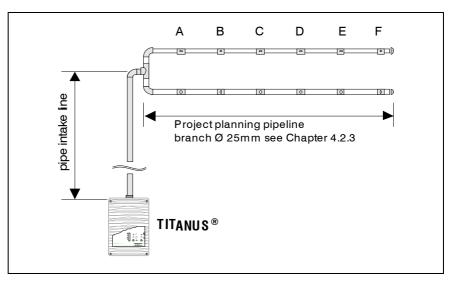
Example of a pipe system for project planning with long pipe intake lines
